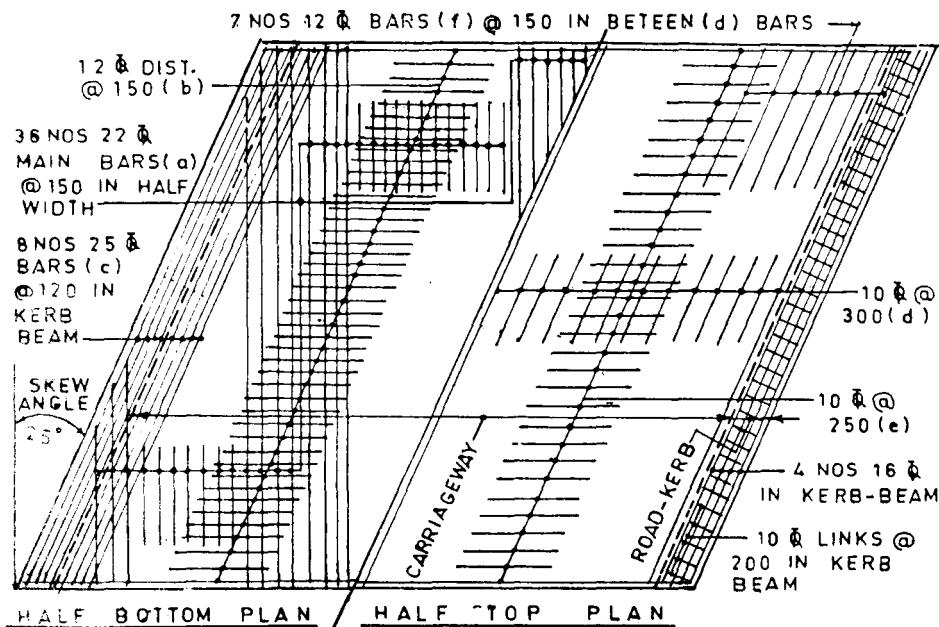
REINFORCEMENT DETAILS OF SKEW DECK SLAB
